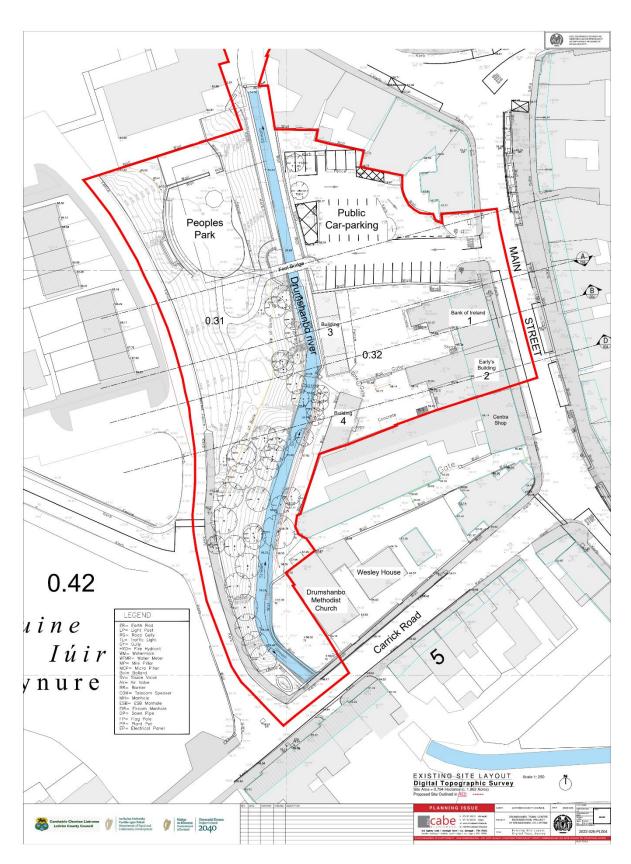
Existing Site Layout Plan (Source: McCabe Architects)
